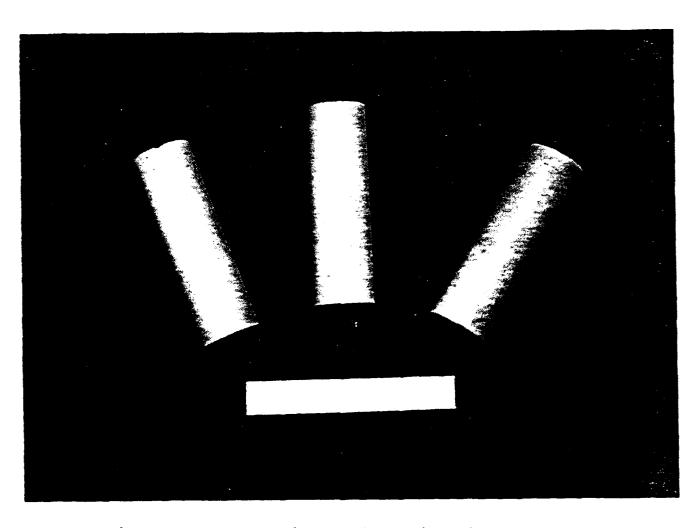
Adhesion test results - wash primed specimens, exterior view.
